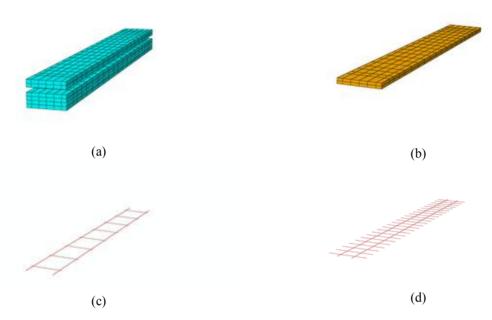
FE models: (a) concrete; (b) foam; (c) rebar; and (d) WWR.
